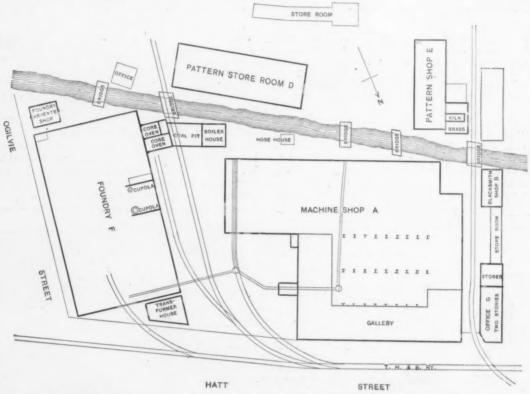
General Layout of the Canada Tool Works-John Bertram & Sons Company, Ltd., Dundas, Ontario.
